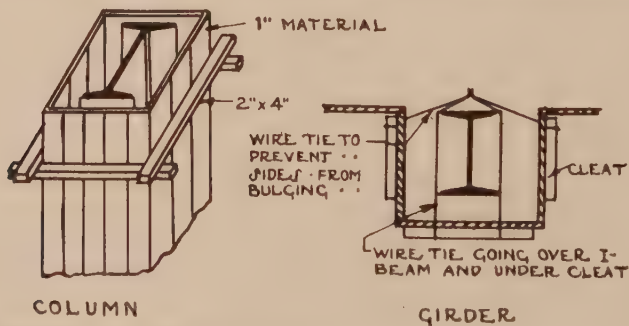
Forms for use where concrete is employed to fireproof structural-steel members.
